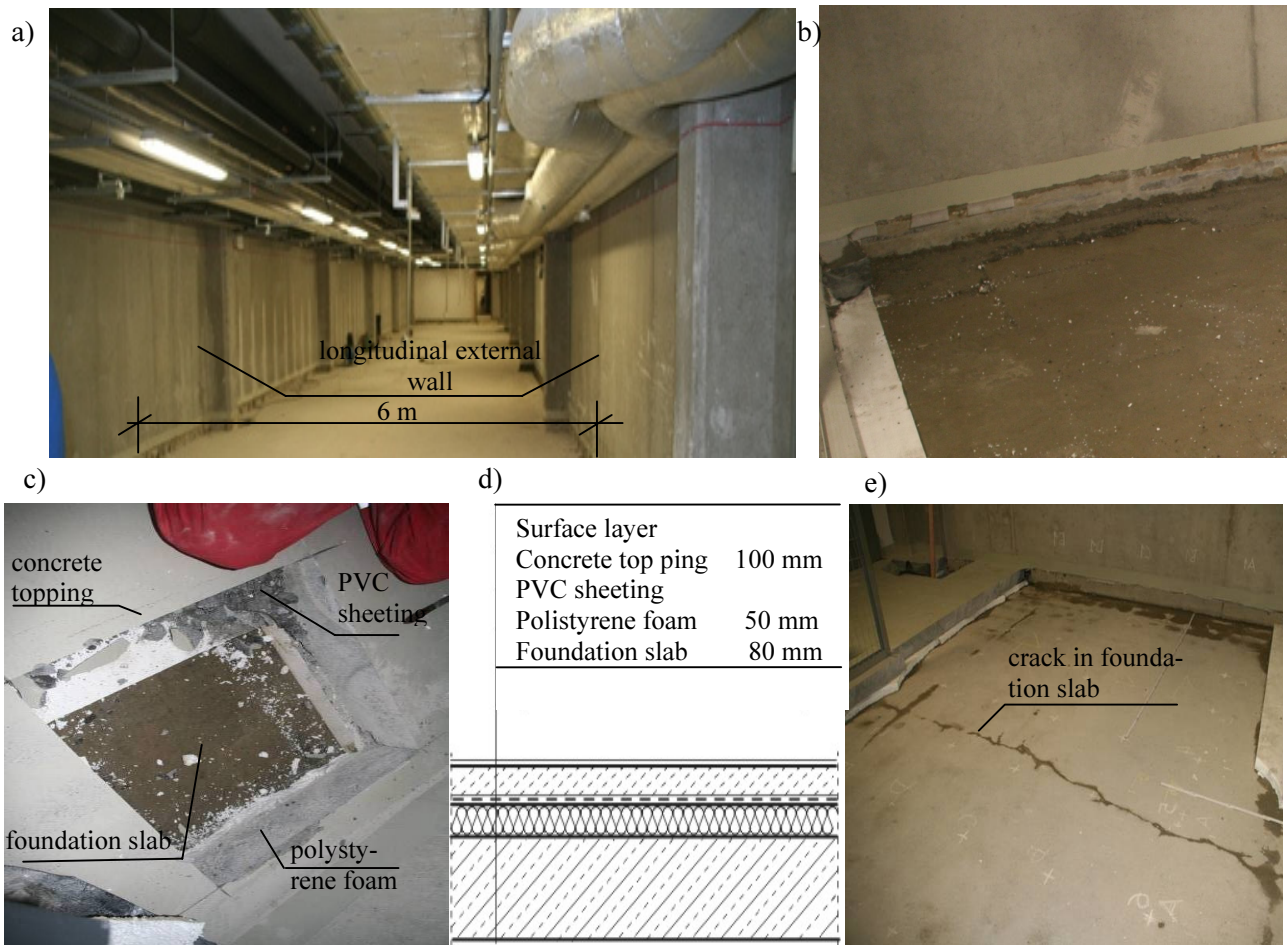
View of rooms in the basement storey and location of pits in foundation slab: a) general view, b) approximate saturation with moisture floor, c) view of test pit, d) cross-section of the flooring layer, d) view of large pit
